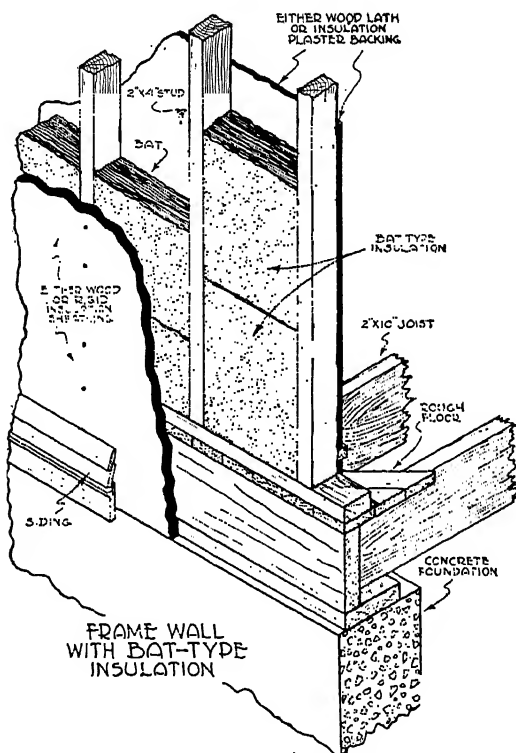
Frame Wall with Bat and Rigid Types of Insulation
